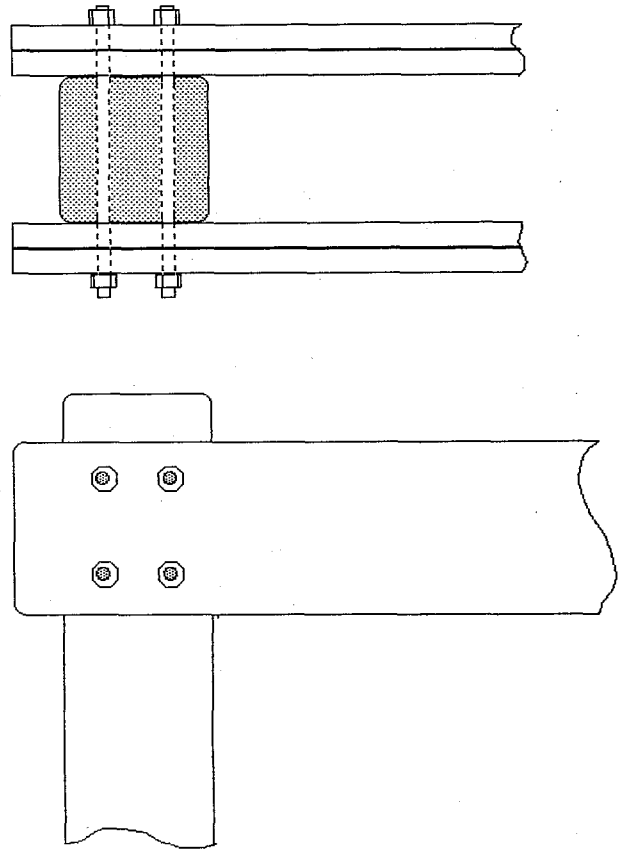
Bolts at Horizontal Beam and Vertical Member
